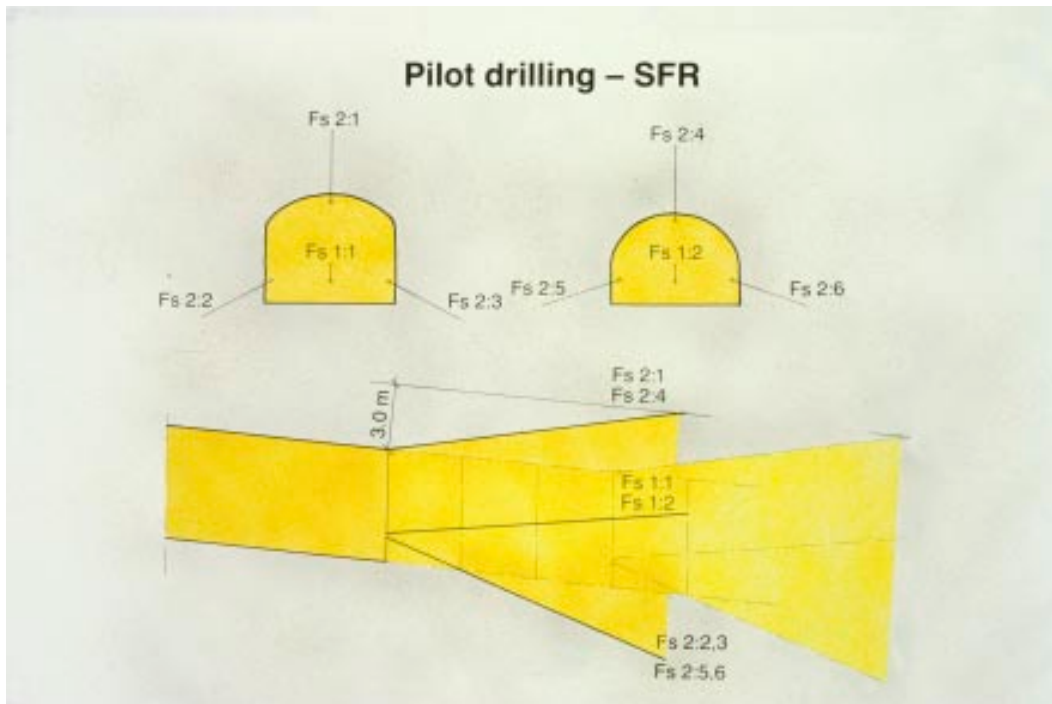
Pilot drilling in plan (a) and section (b) through the Singö deformation zone in the access tunnels, SFR.
